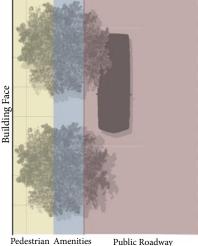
Village Center Street Envelope Components - Please consult Village Center Plan for the other recommended typologies.
